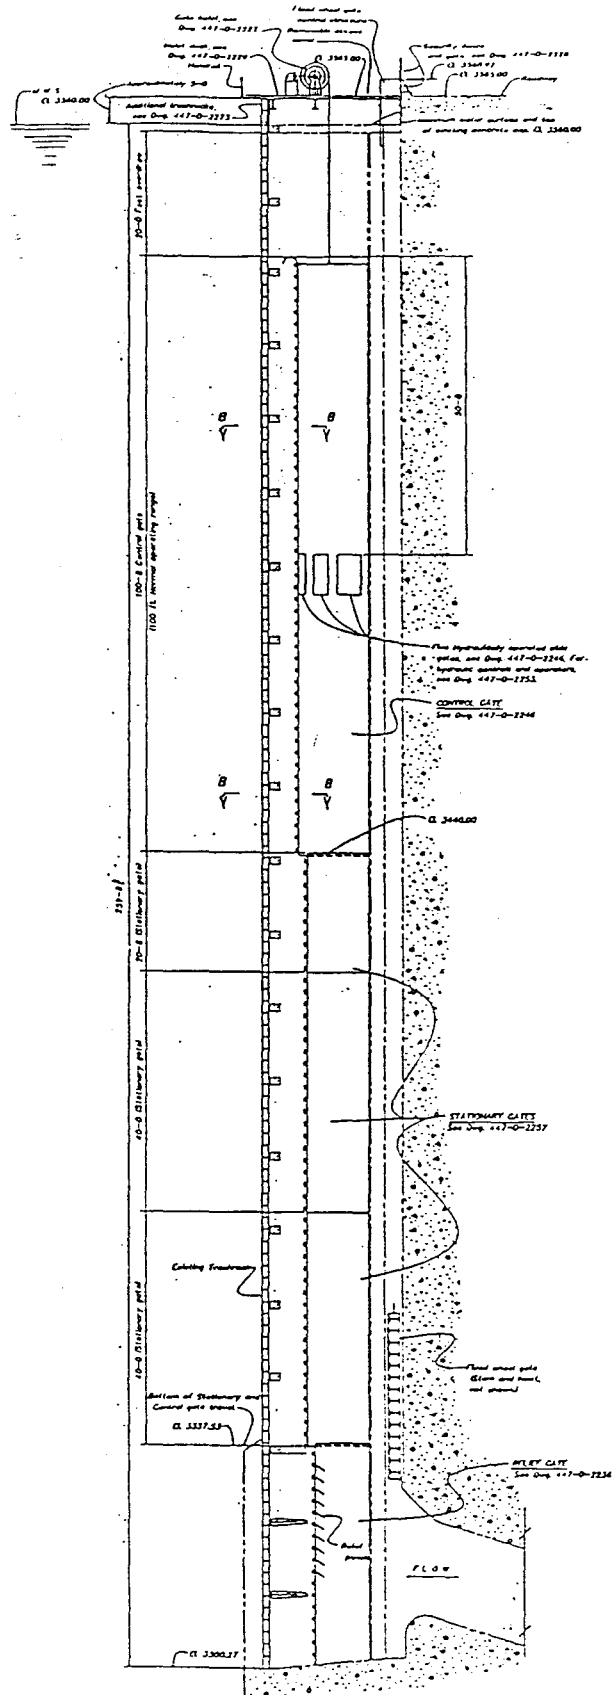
Conceptual layout: VE proposal concept (elevation).
